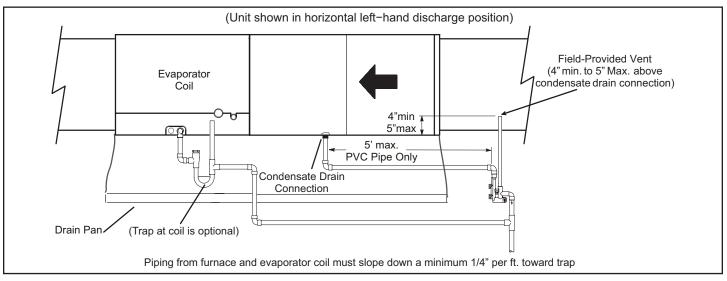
Furnace with Evaporator Coil Using a Common Drain
